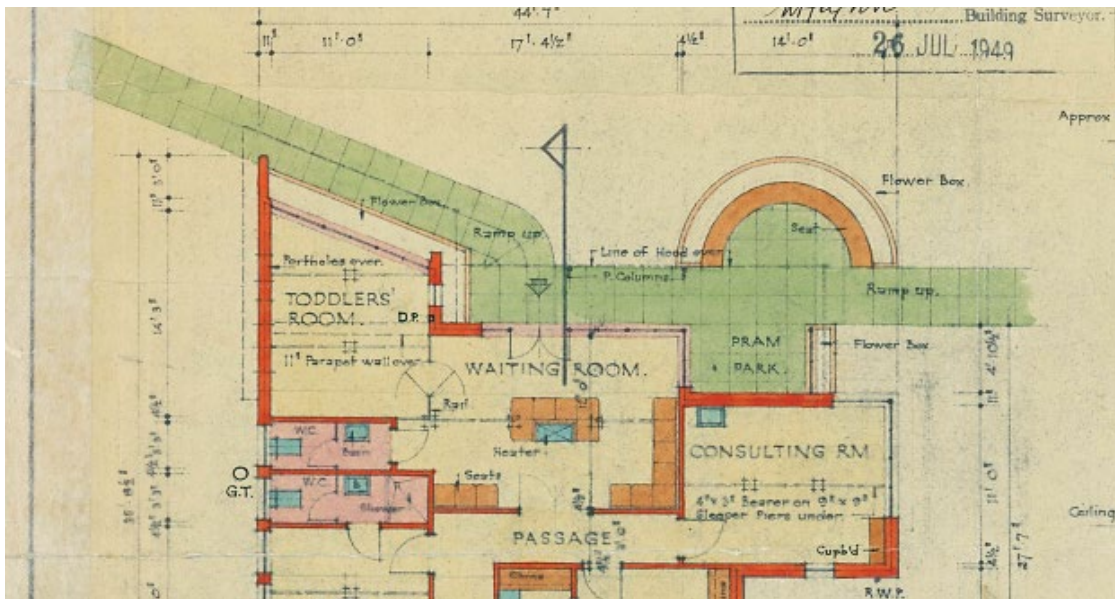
Detail of floor plan for A Baby Health Centre (BA 229/49) showing semi-circular component of concrete path.
